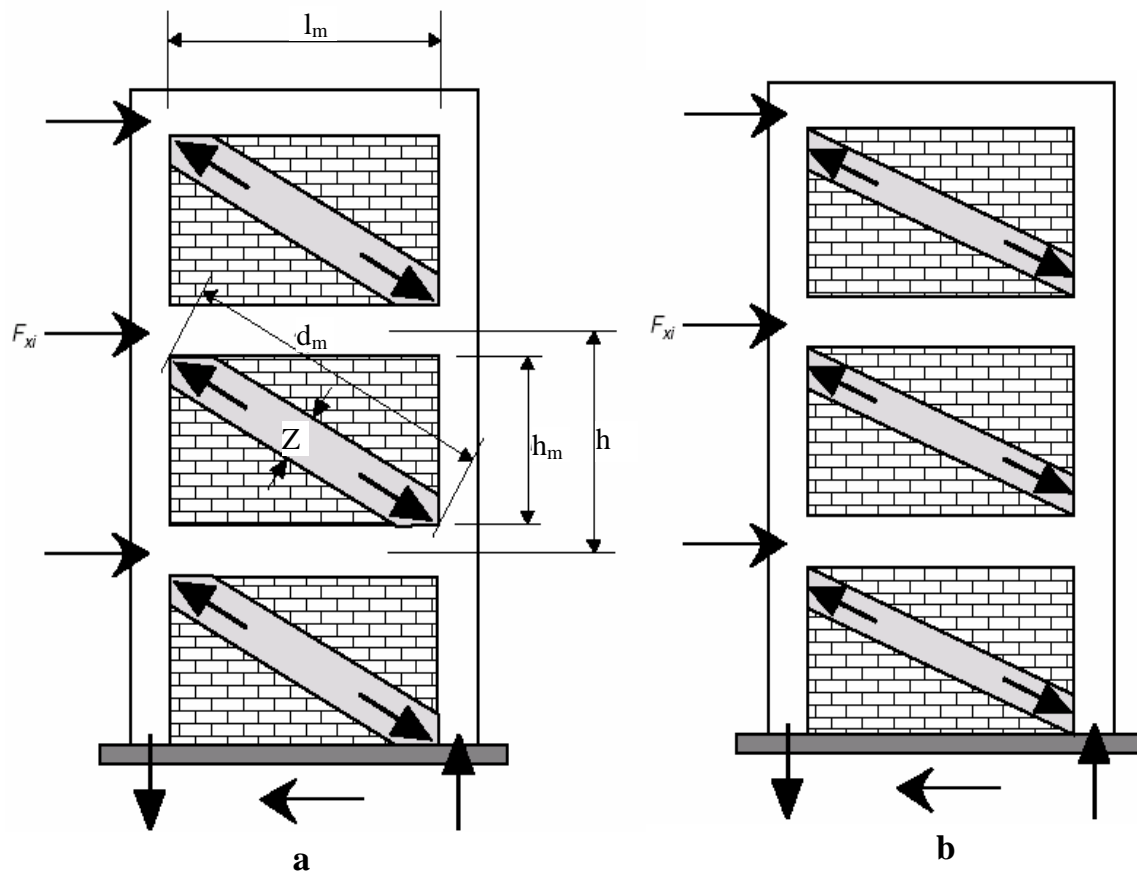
Compression Strut Analogy (a) Concentric Struts (b) Eccentric Struts.
